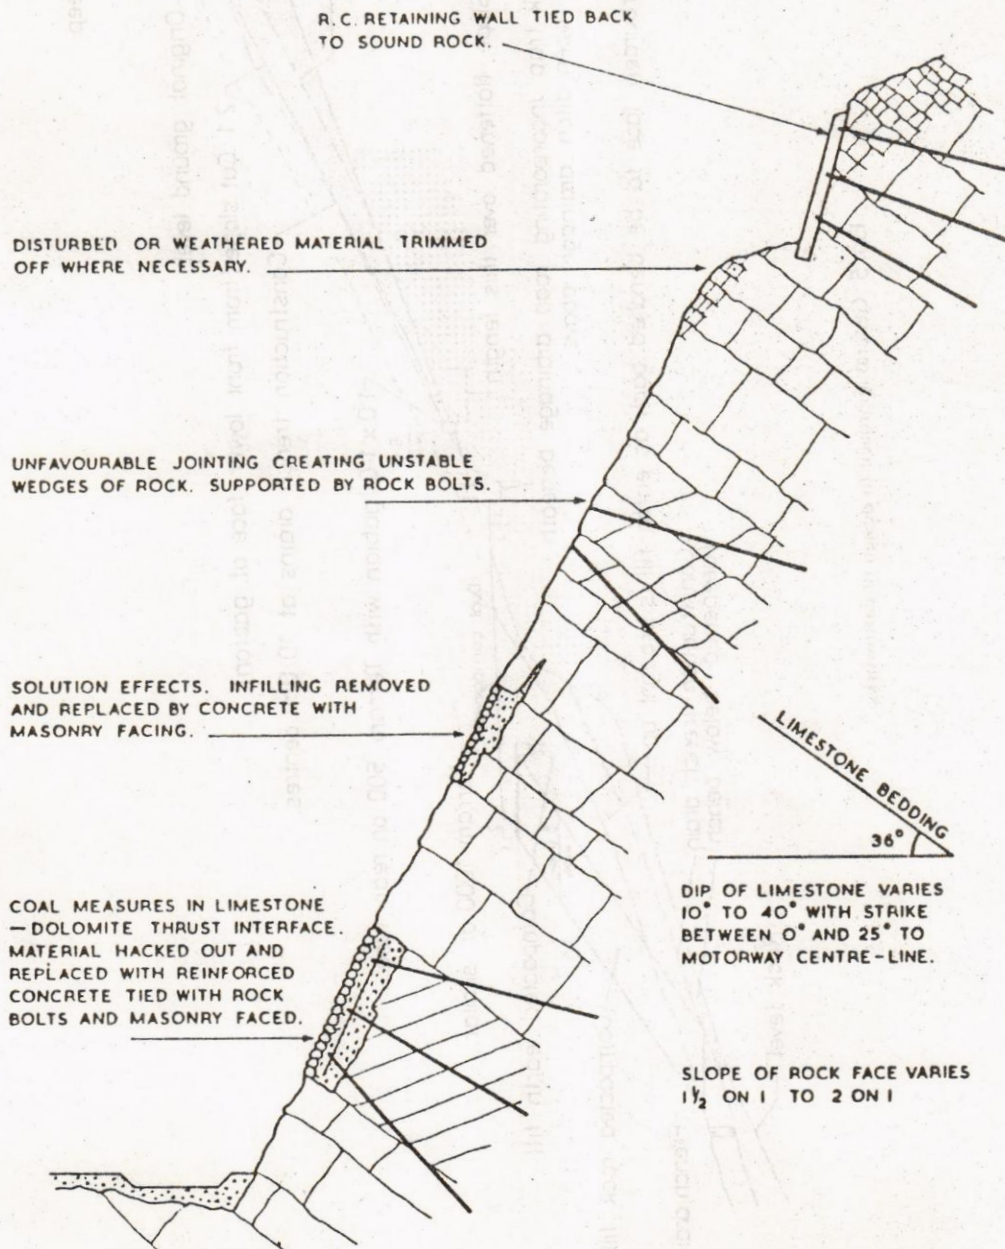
Composite cross-section showing types of revetting on the main rock faces.
